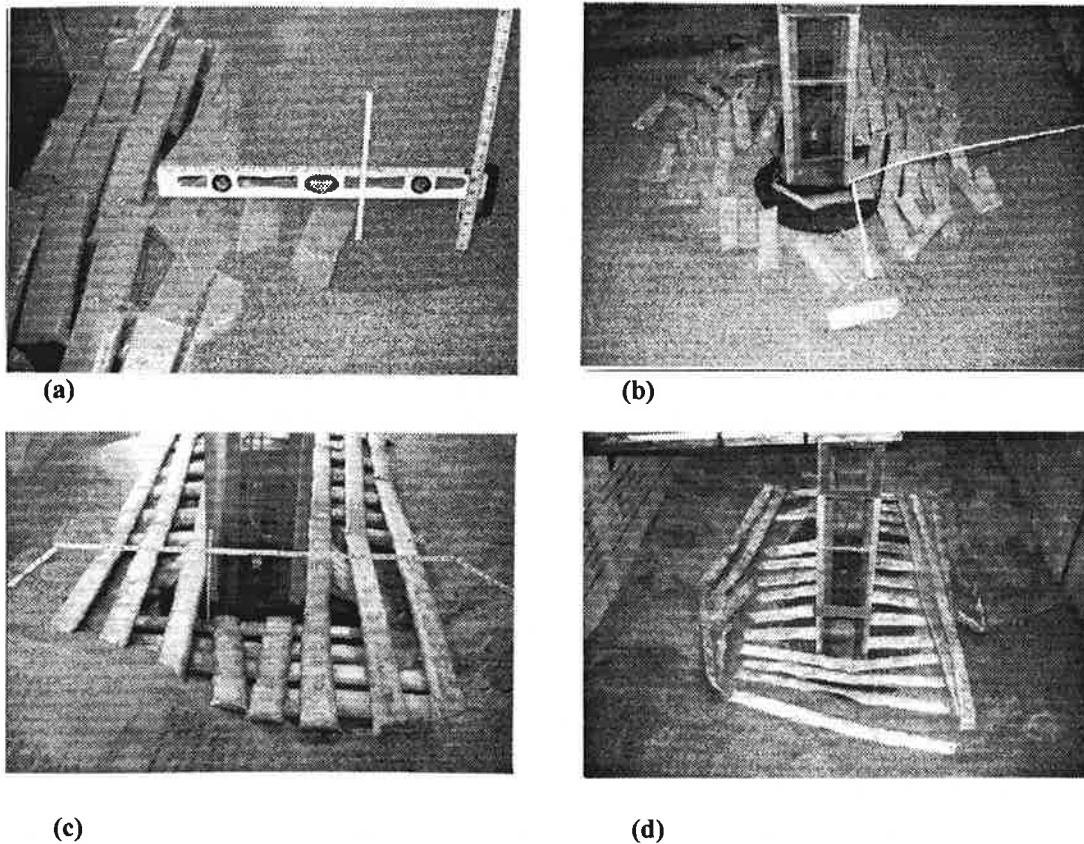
a) Sinking of the grout bags. b) Dispersion of the grout bags. c) Undermining of the grout bags. d) Failure of the grout bags.
